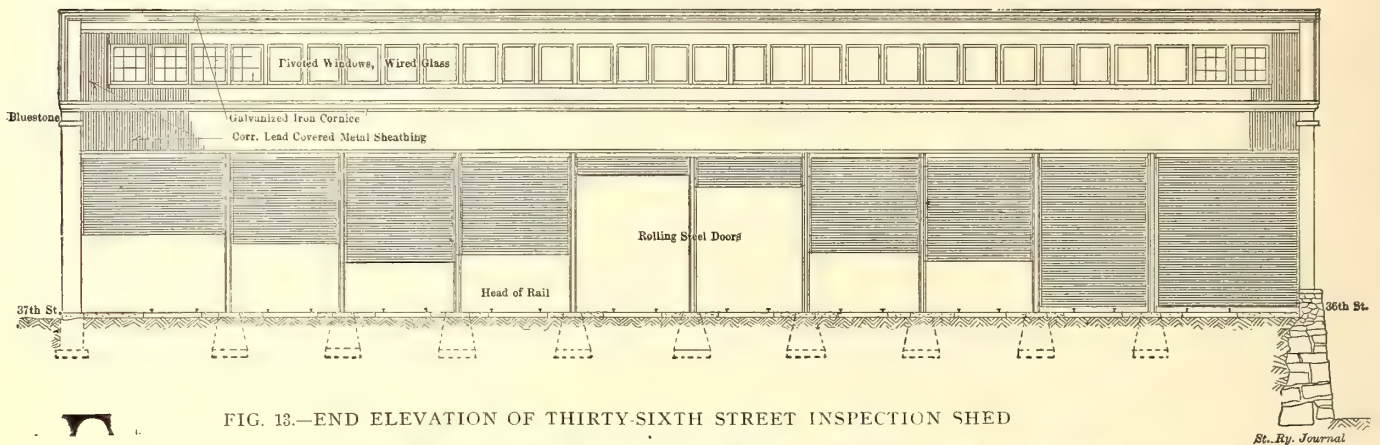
END ELEVATION OF THIRTY-SIXTH STREET INSPECTION SHED
